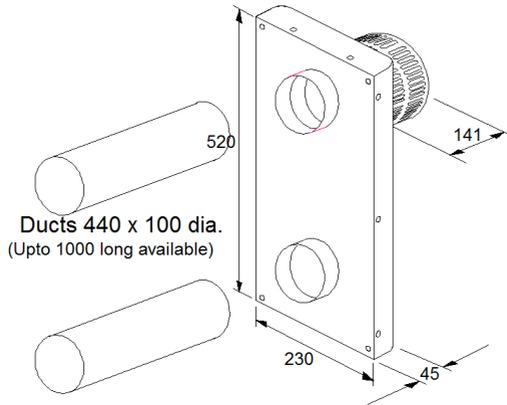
Flue Pipe and Air Box with terminal (all dimensions in mm)
